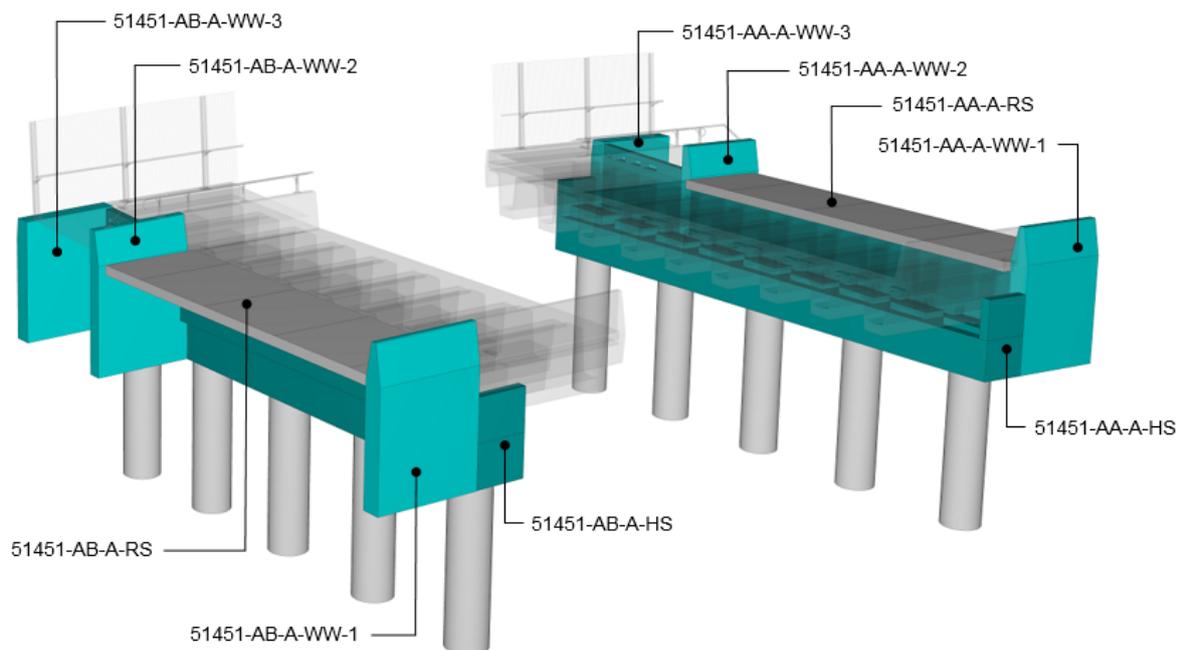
(b) – Object naming convention for abutments with multiple wingwalls
